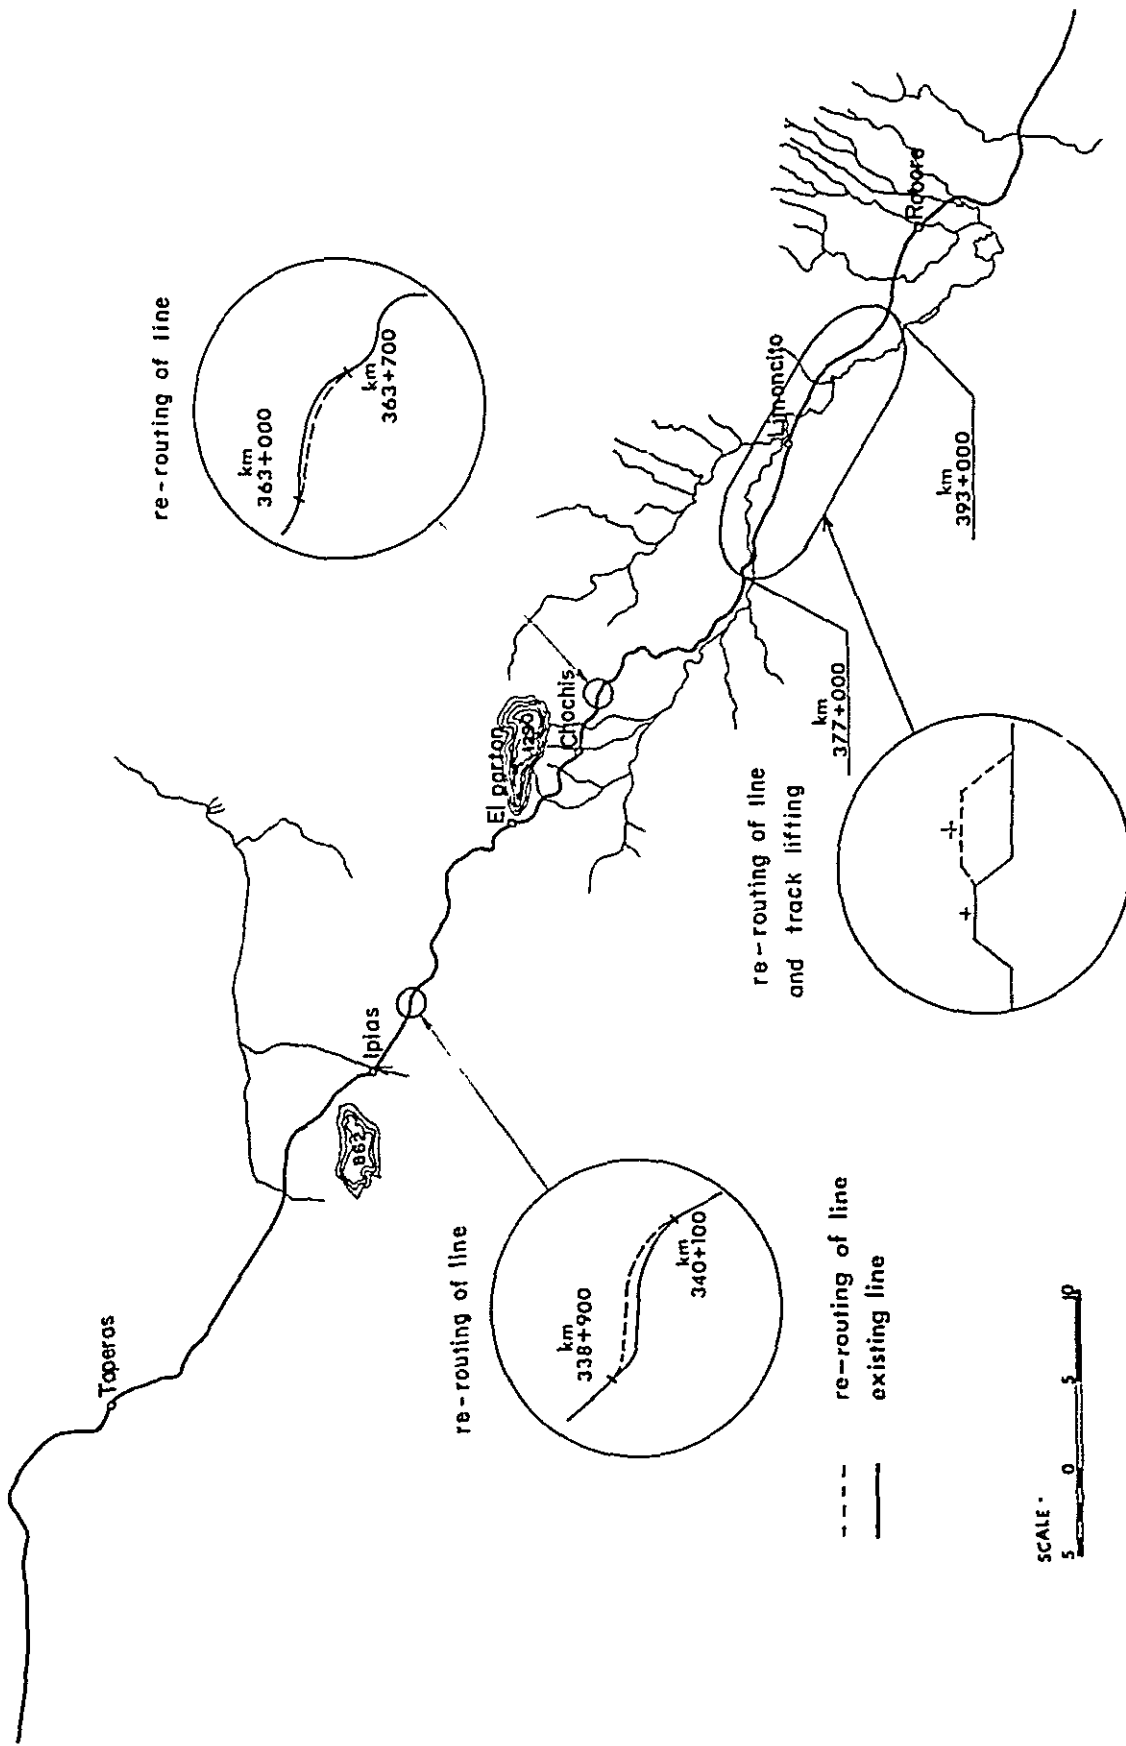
Section Planned for Route Change of Existing Line
